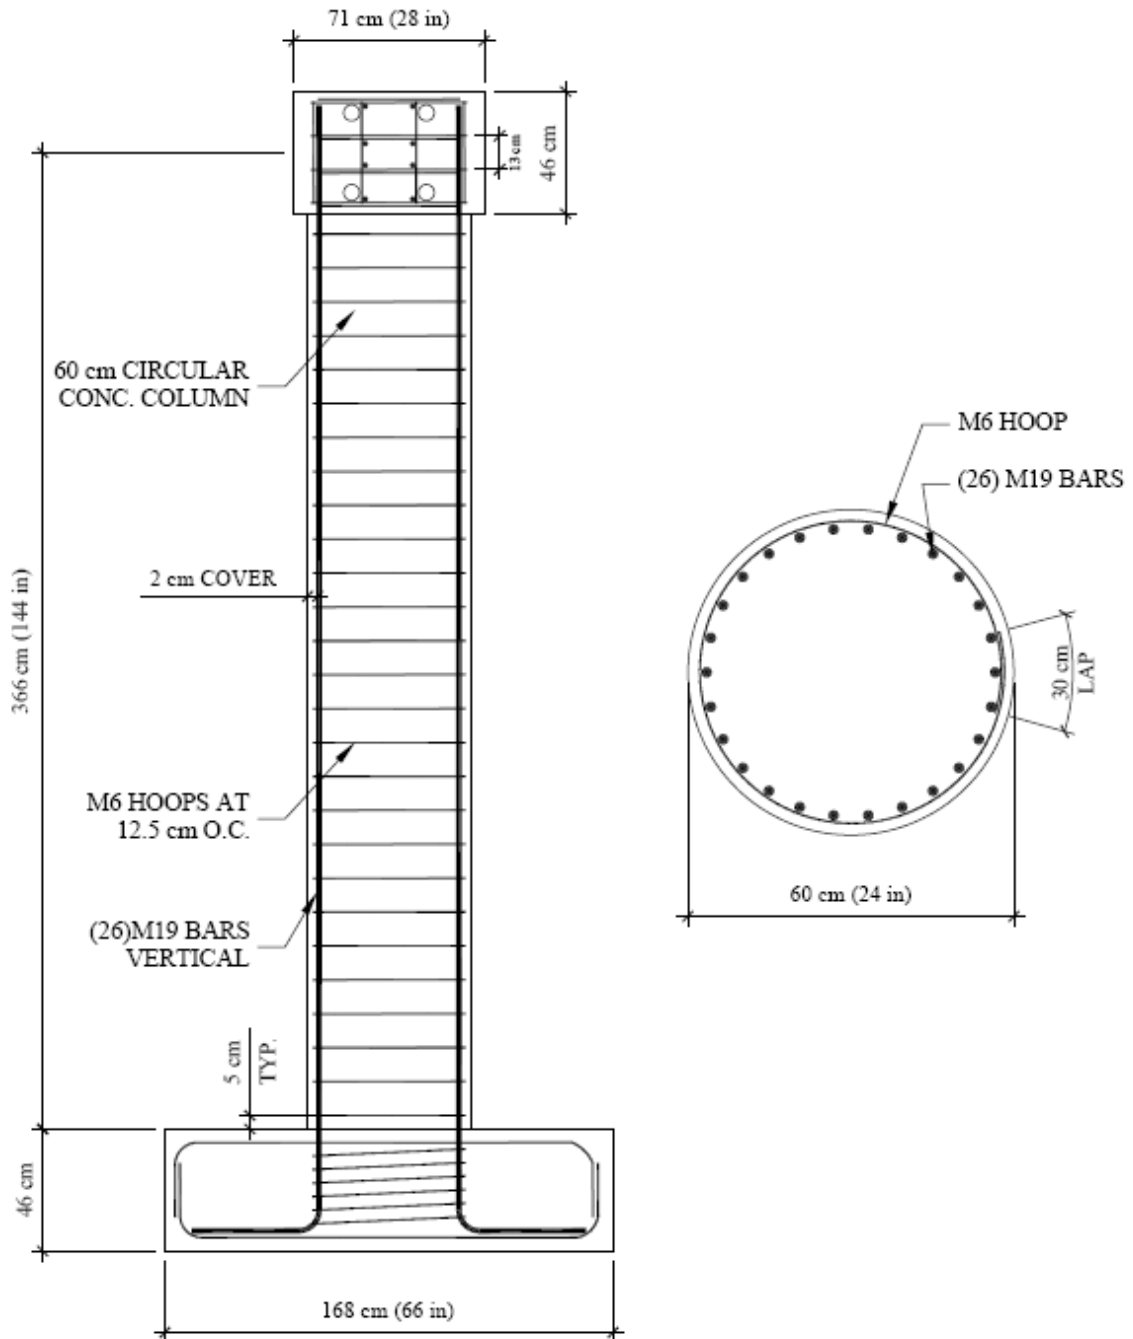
Details of the Circular Continuously Reinforced Flexure Column Test Specimen
